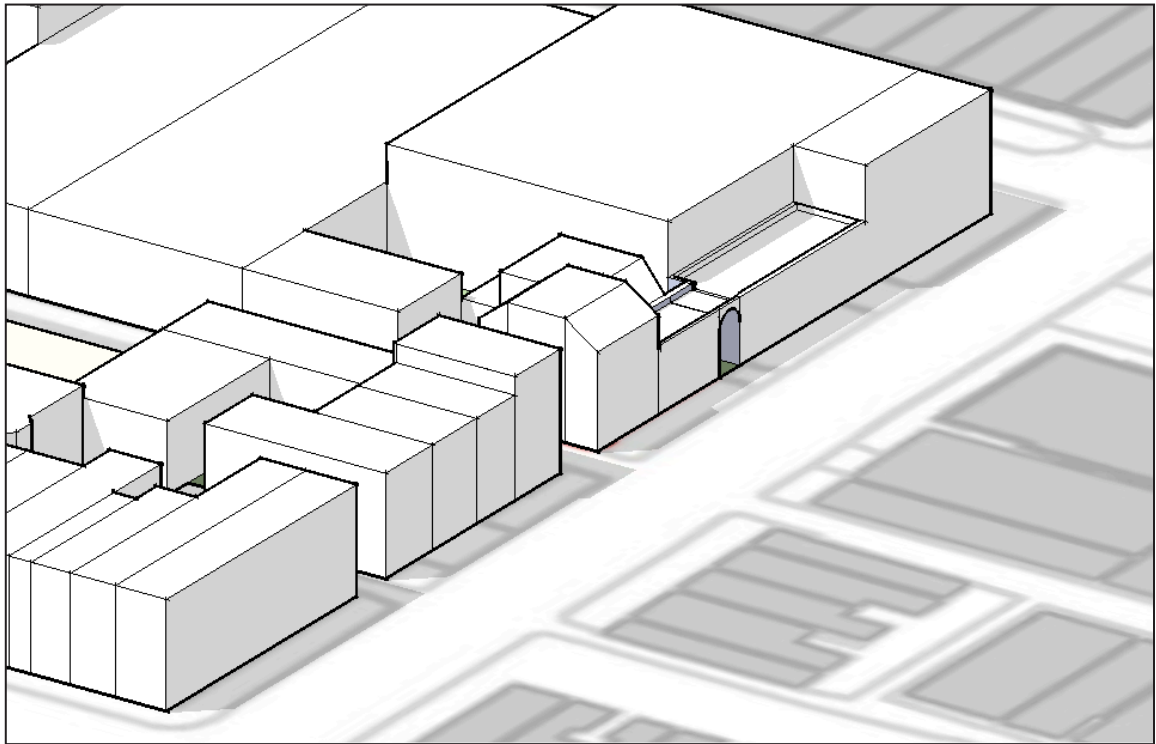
View down Lafayette Street. Infill provides continuous street frontage and rooftop garden connects old and new. (Author)
